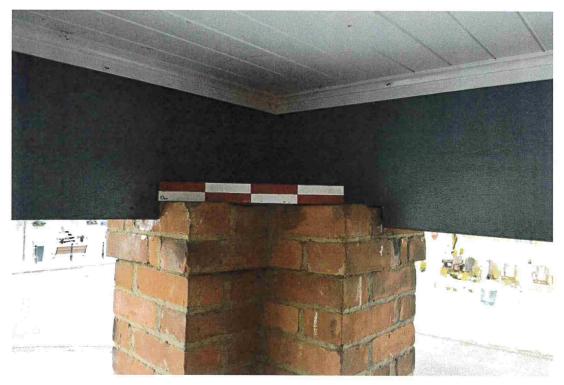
Brick pier, fascia, and ceiling (December 2016).
